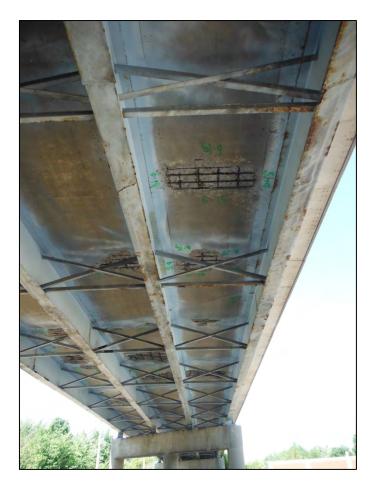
Looking north over the eastbound lanes at deck spalling. This appears to be the worst area.
